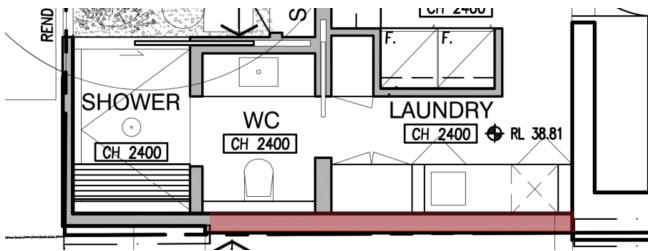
Proposed ground floor plan showing the extent of the proposed southern boundary wall, constructed within title boundary (highlighted in red)
